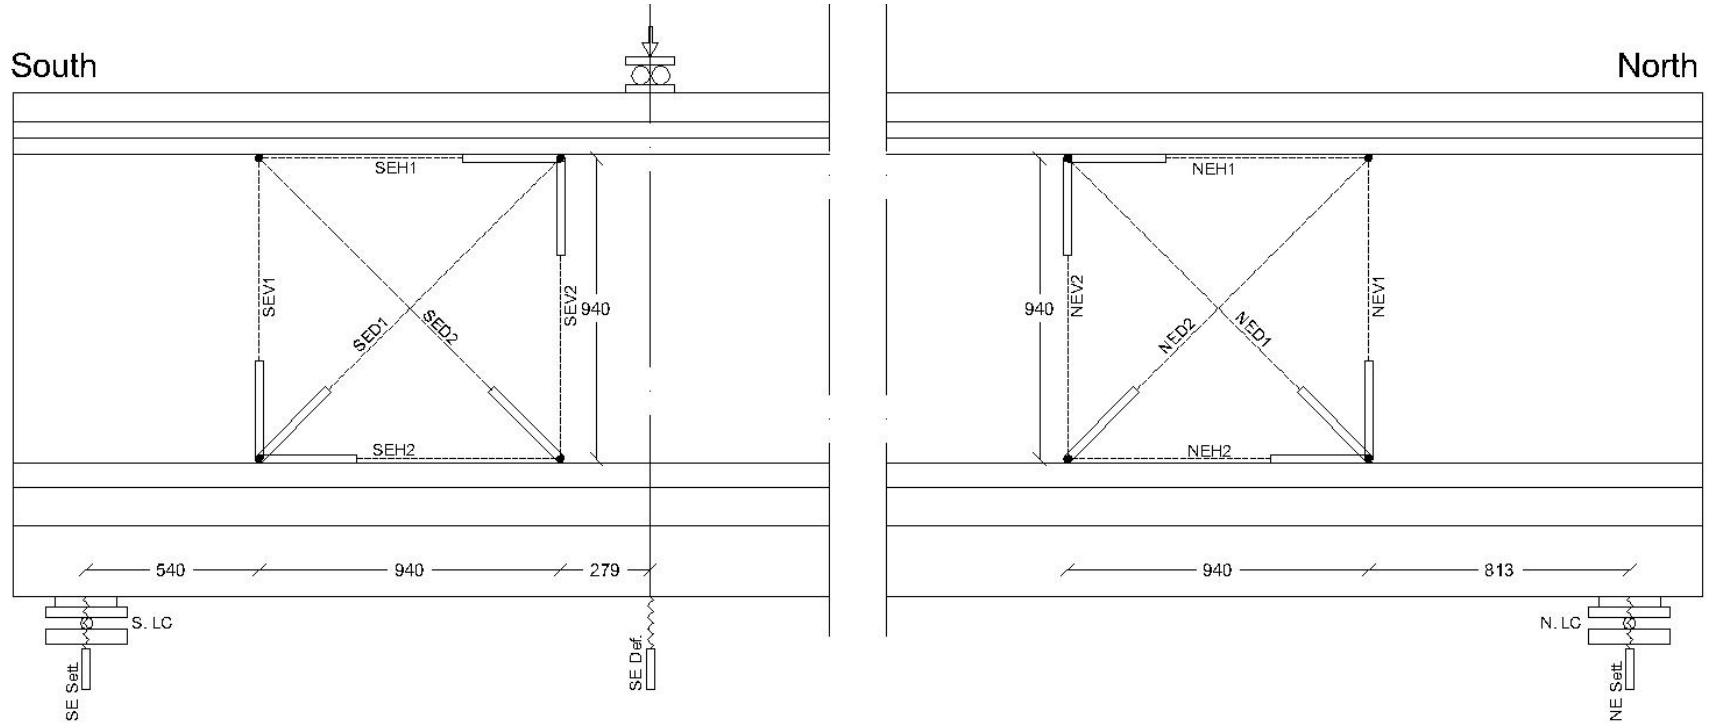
Layout of LVDTs underneath the Girder and in Rosette Strains for Girder E2-South End Testing (Labib 2012) (Cont'd)
